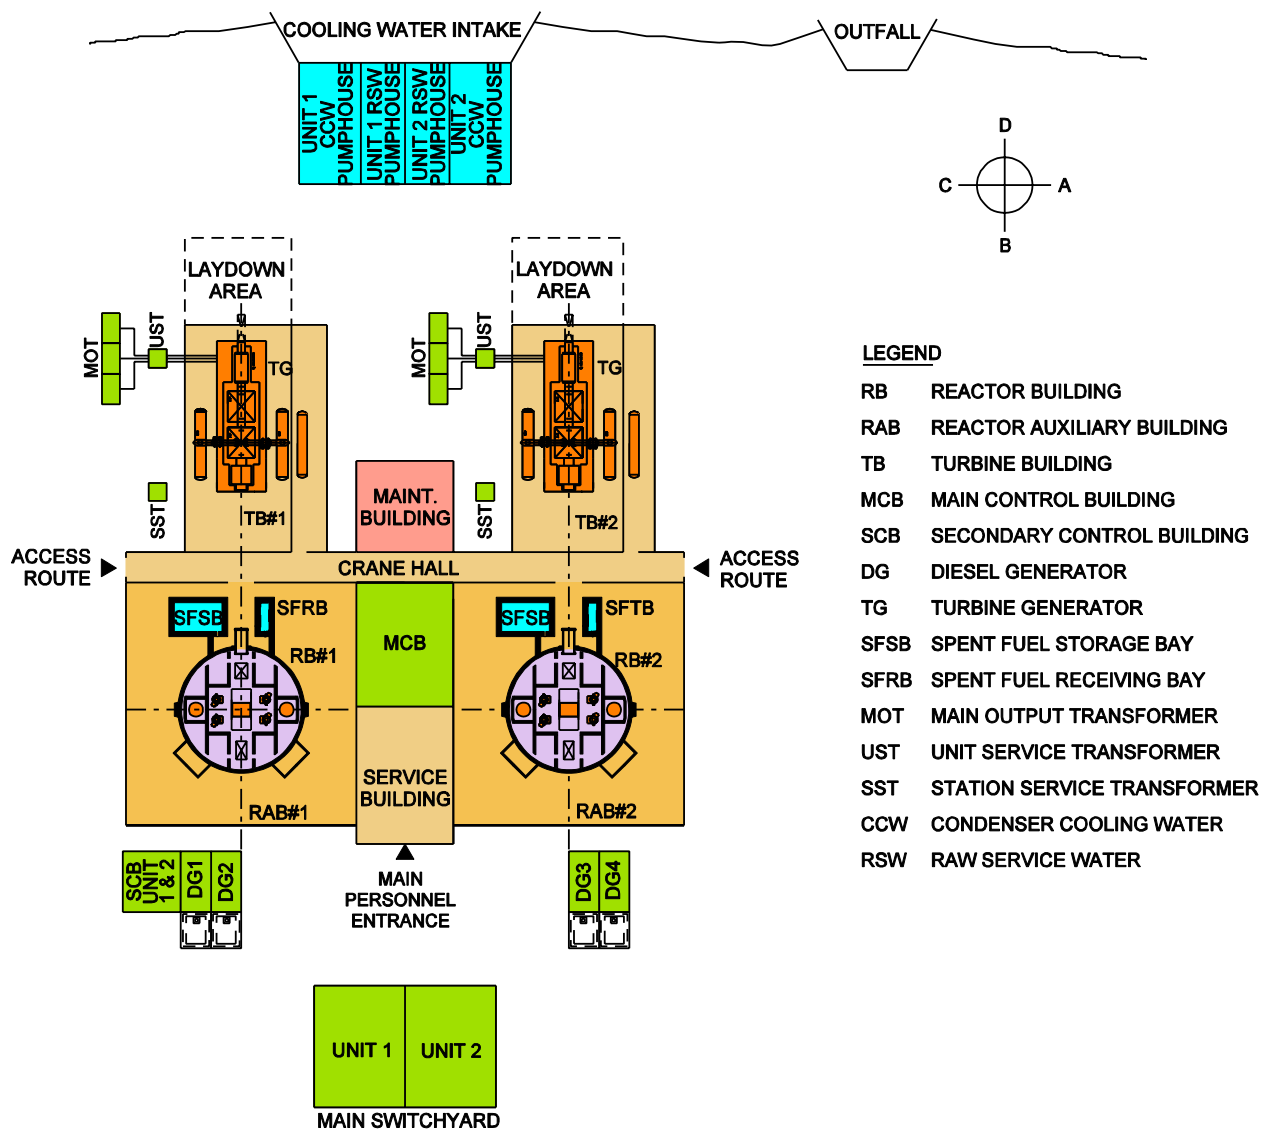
ACR-700 Two Unit Plant Layout of Main Structures
